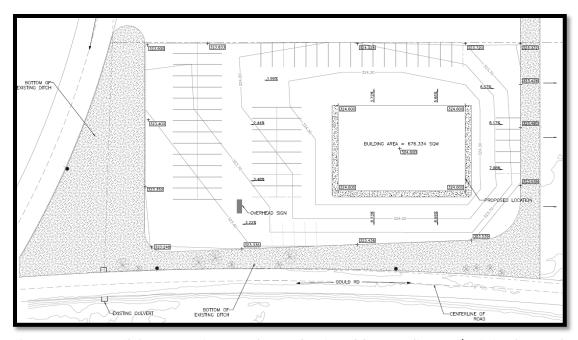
Detail from Drainage Plan submitted by applicant (original attached).
